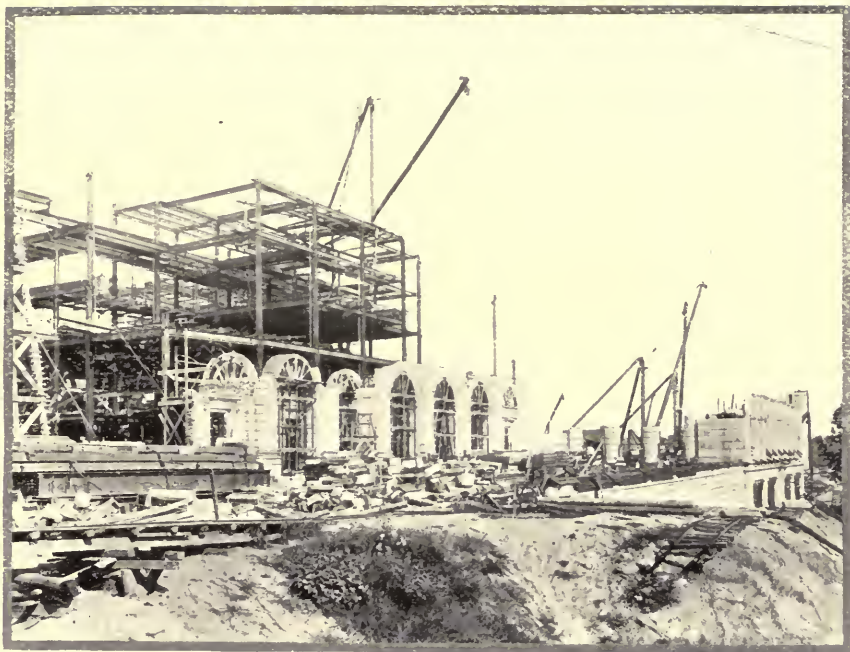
THE WASHINGTON TERMINAL UNDER CONSTRUCTION.
